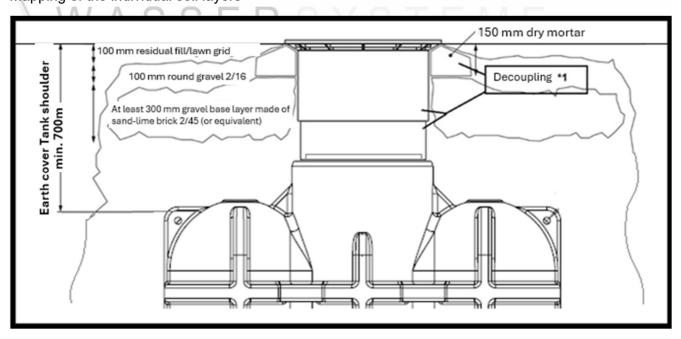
On-site construction of a drivable superstructure with telescopic dome or telescopic segment
